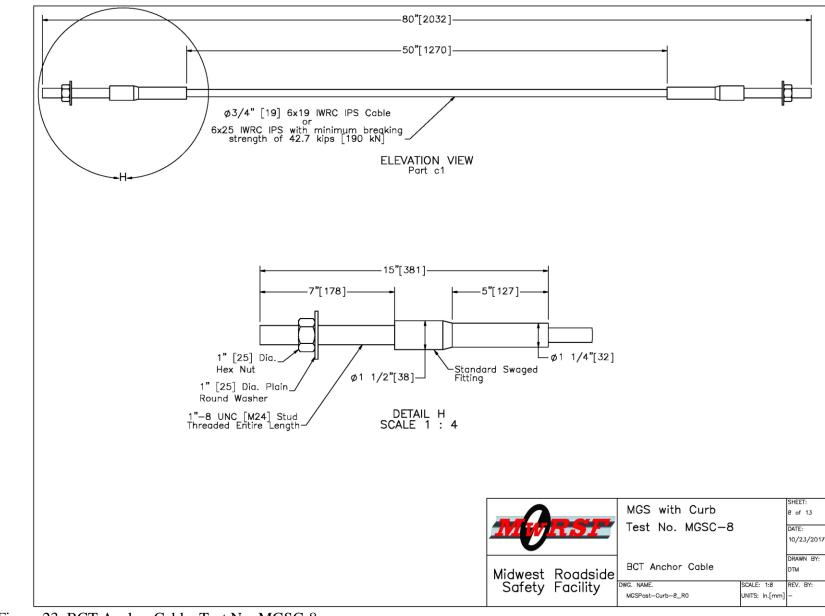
BCT Anchor Cable, Test No. MGSC-8
